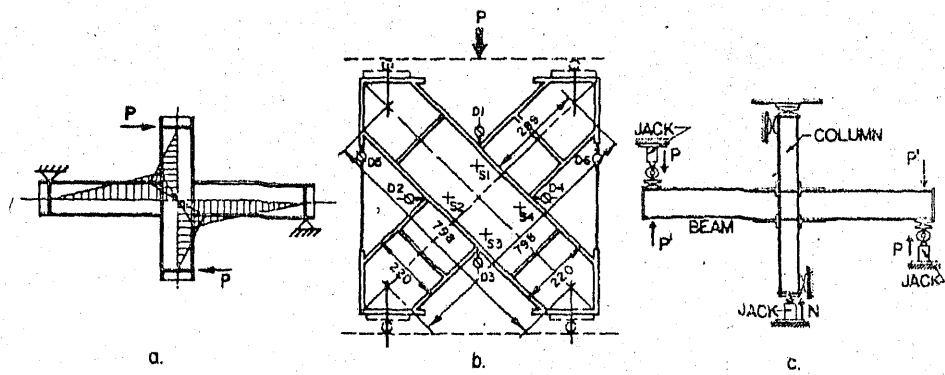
TESTING ARRANGEMENTS USED IN PREVIOUS INVESTIGATIONS
